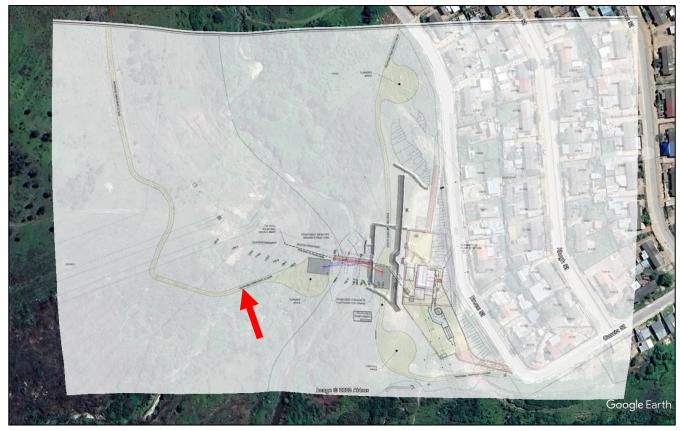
Temporary work areas and proposed gravel road down to the pipe bridge
